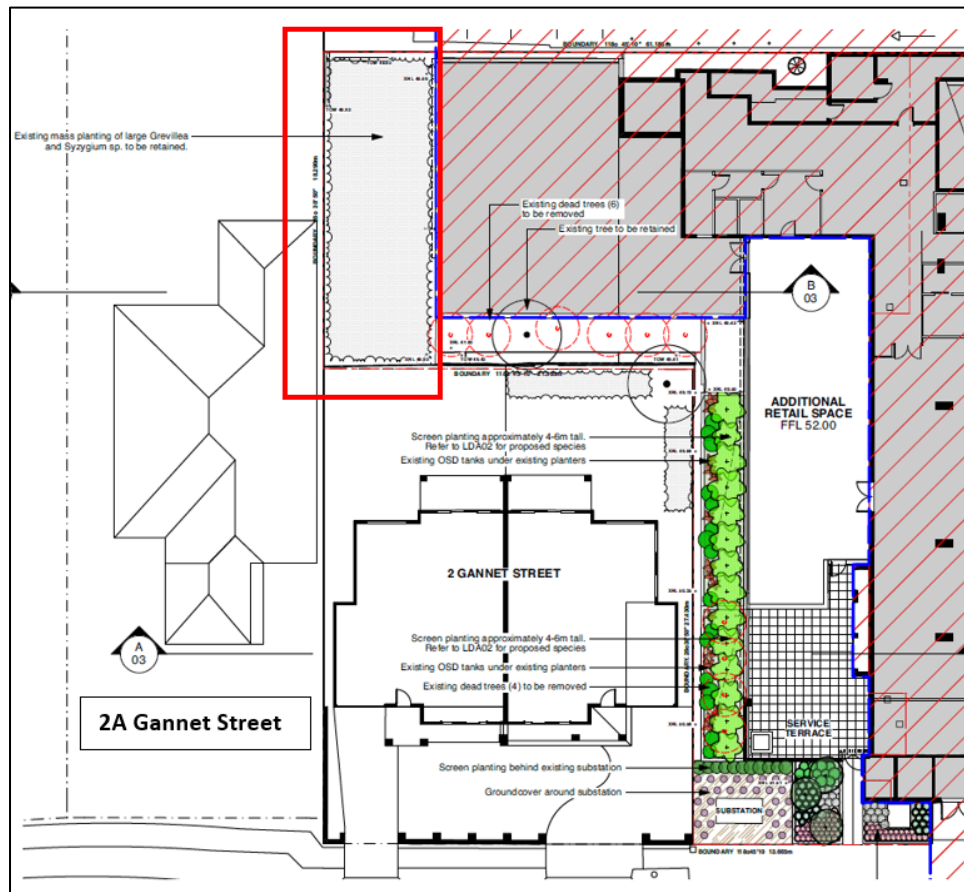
Amended landscape plan showing landscape buffer between the subject site at 2A Gannet street is being retained
